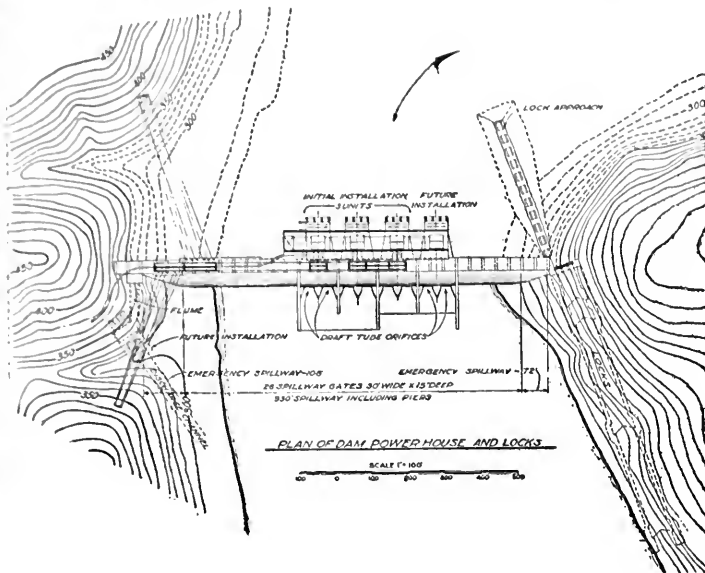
GENERAL PLAN AND ELEVATION OF ALABAMA POWER COMPANY'S DAM AND POWER HOUSE ON THE COOSA RIVER
